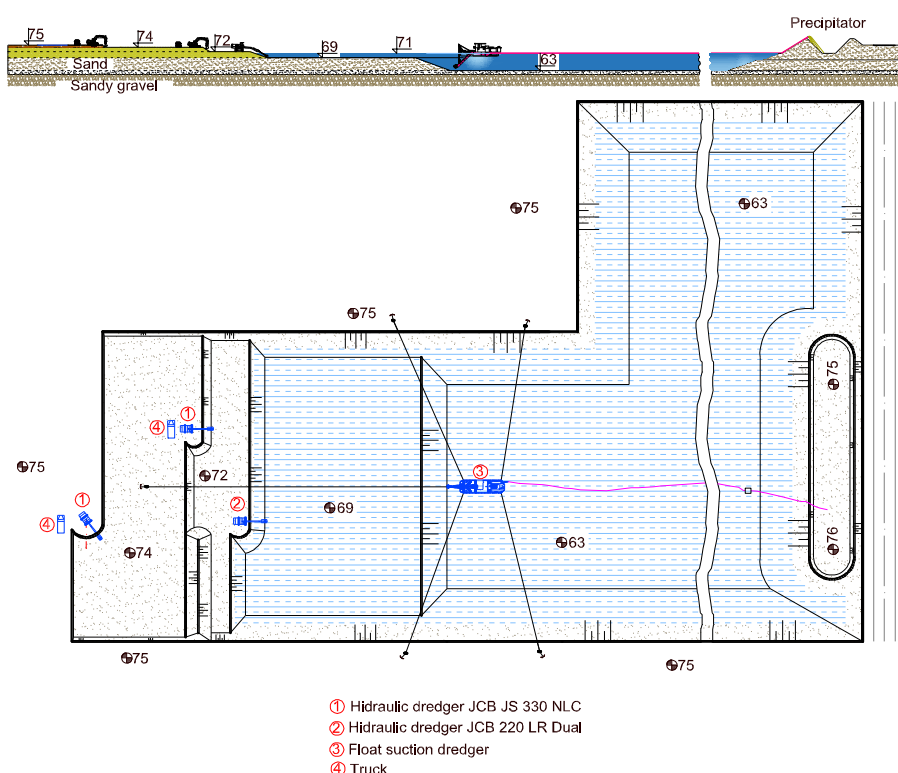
Consistent technological scheme of sand excavations and overburden in extension of surface mine Jakovačka kumša.
